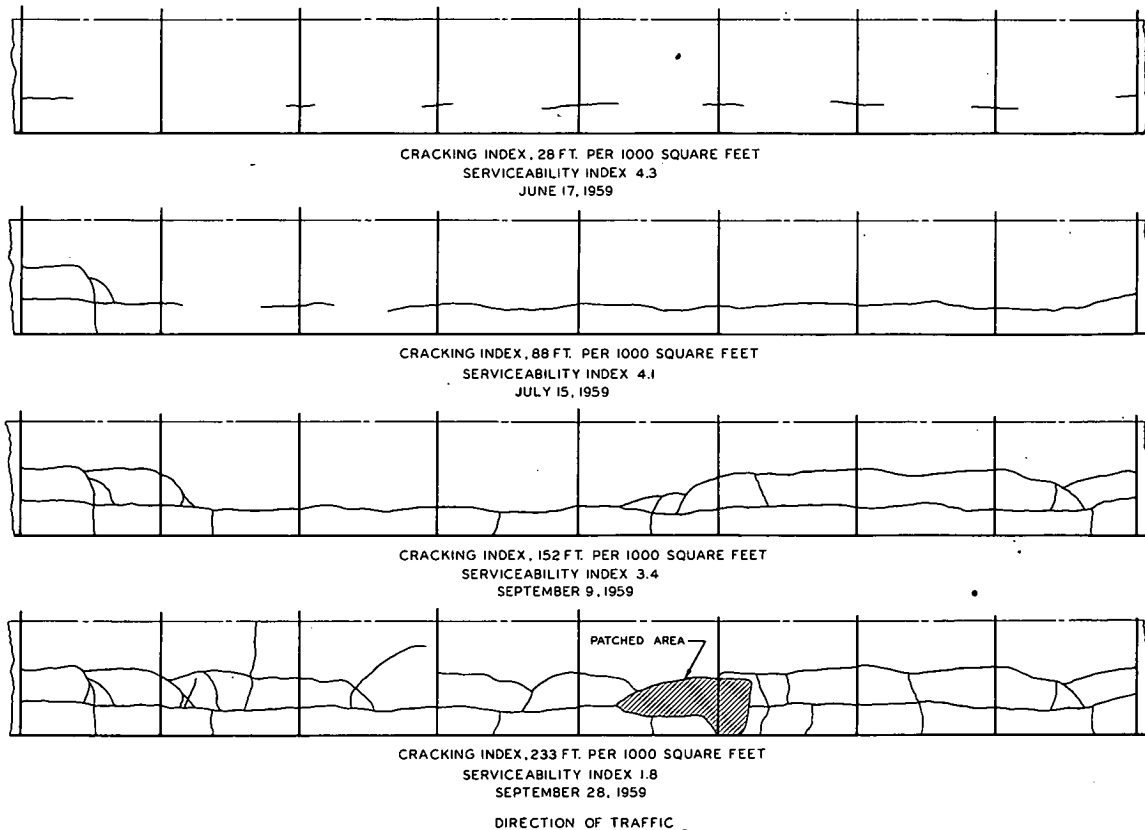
Progression of cracking in a 3.5-in. nonreinforced section with paved shoulders on 6.0 in. of subbase, 24-kip tandem axle load.
